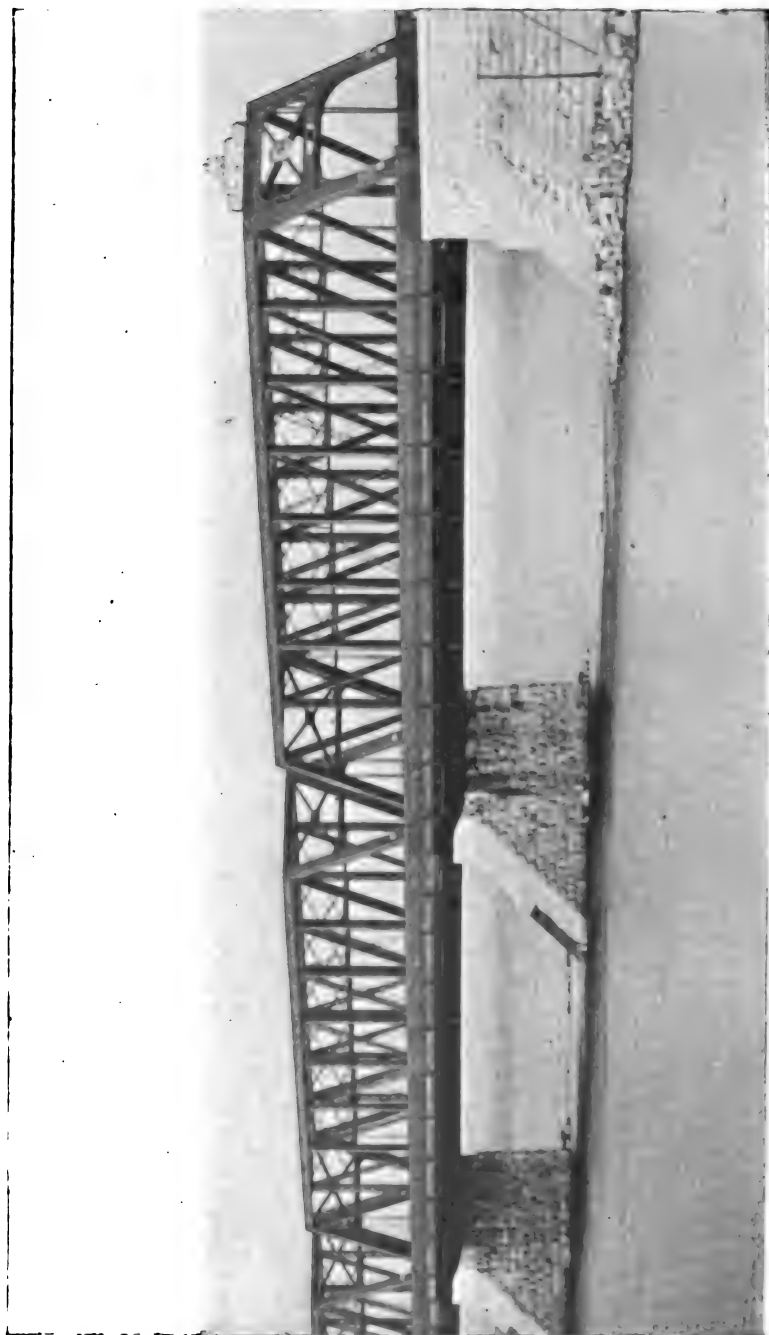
VICTORIA JUBILEE BRIDGE PIERS.
